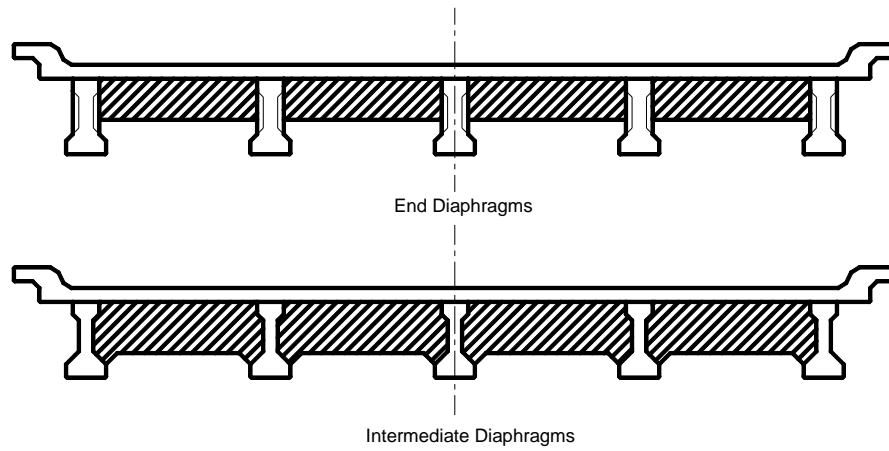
Diaphragm Layout – Lampasas River Bridge
